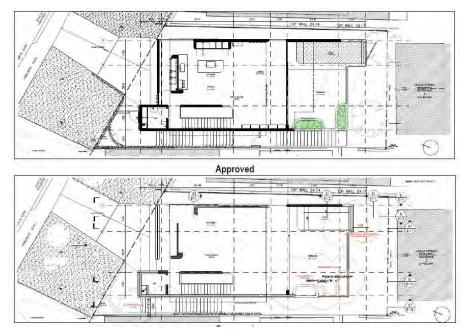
Comparison Plans between the Approved and Proposed Development at First Floor Level (Source: GSA Statement of Environmental Effects)
